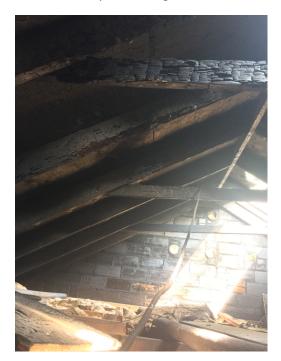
Any remaining wood roof structure is in poor condition and should be demolished (IMG 6968)
